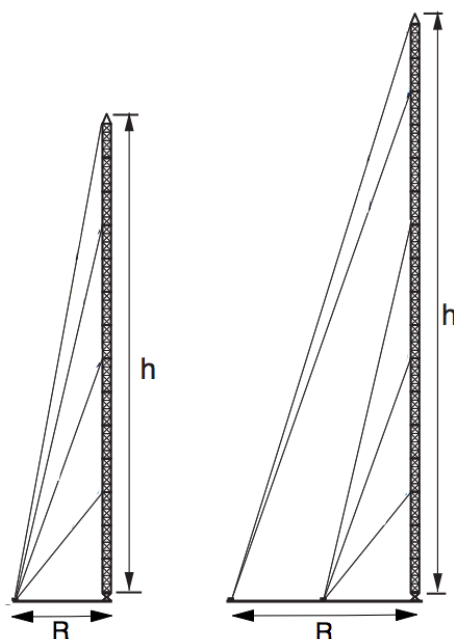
typical wind-bracing configurations for lattice towers. Left is the one-anchor type, right the two-anchors
